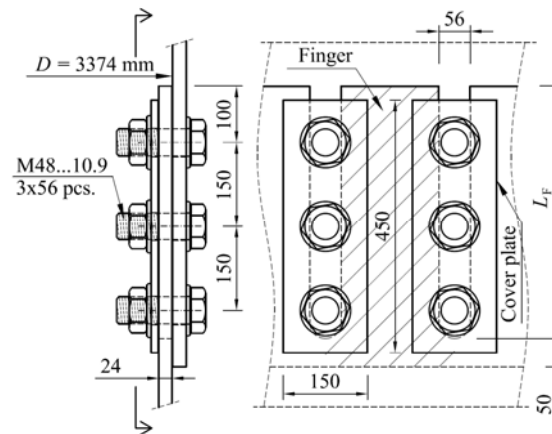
Layout of the Friction Connection in a Real-scale Tower Considered in the Study
